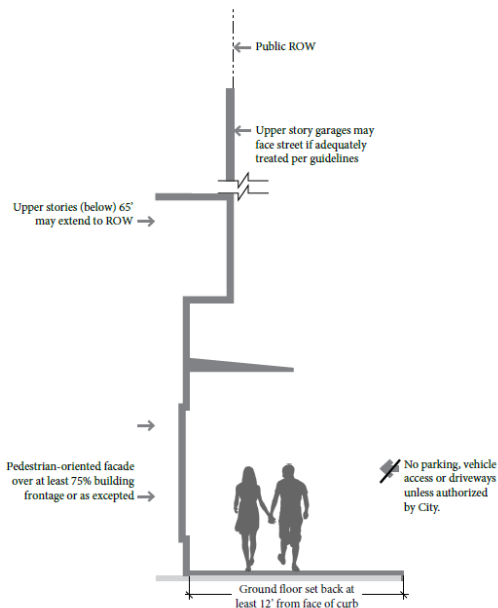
D.2: Summary of requirements for building façades facing a Type B Pedestrian Oriented Street (this diagram is for illustrative purposes only. See Section 18.120.220.D for stated requirements).
